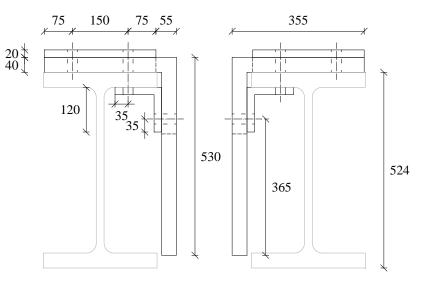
Prestress support dimensions (in mm) – frontal view.
